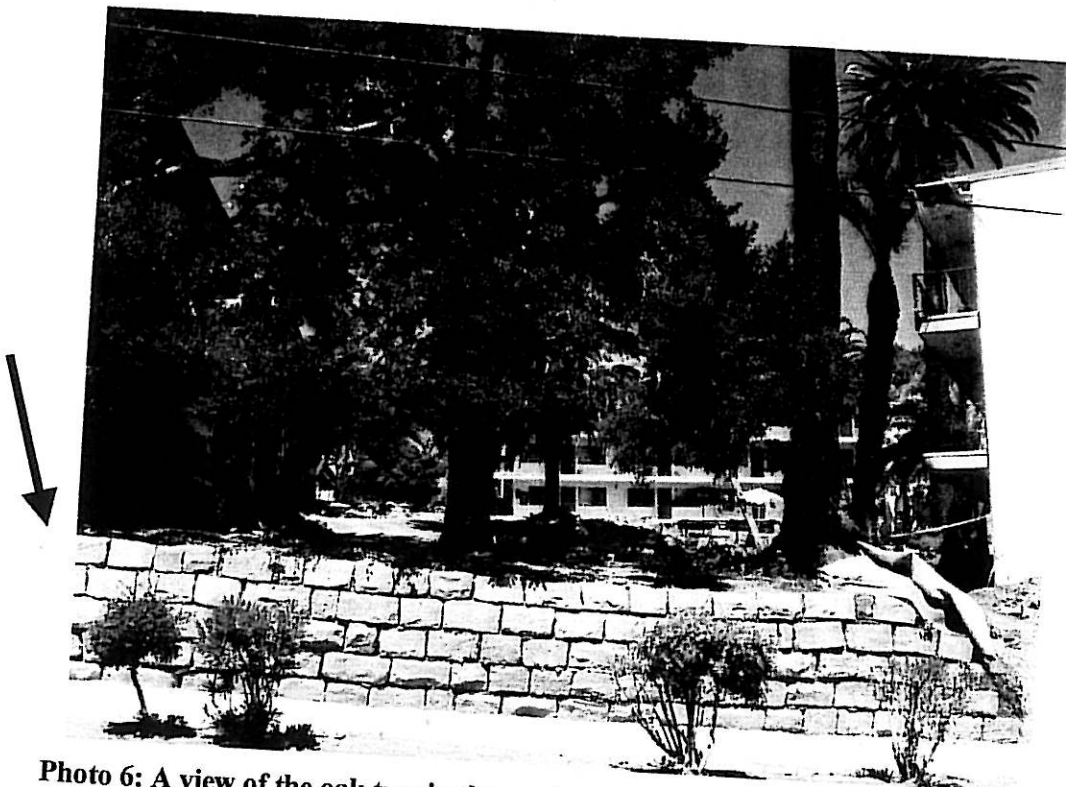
A view of the oak tree in the center. A new stairway should be located to the left (north end) of the wall. Arrow
